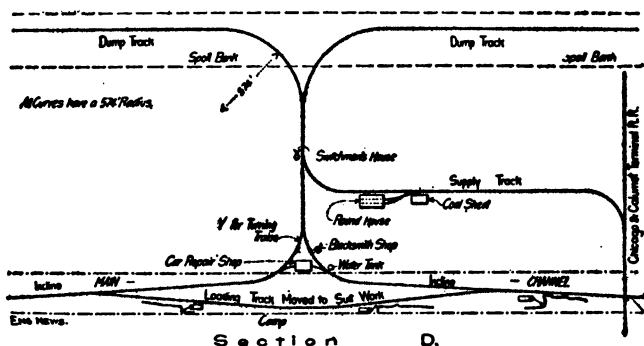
Another Arrangement of Track, Chicago Drainage Canal.
